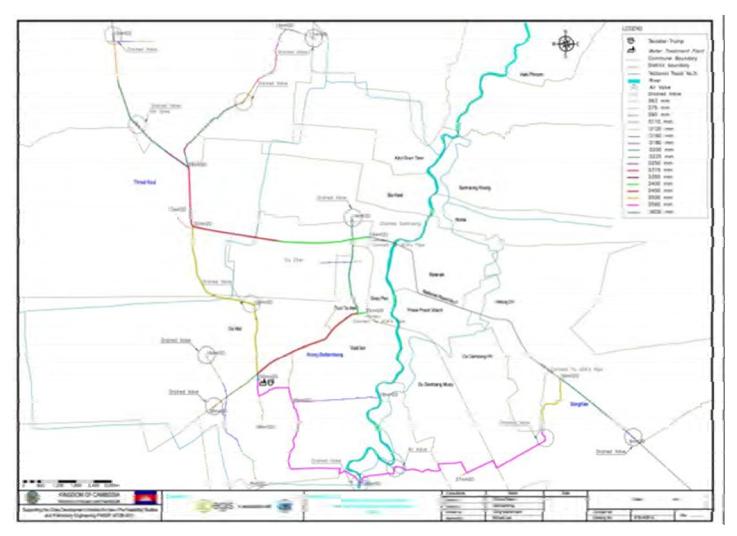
Layout plant- Piped Network of Battambang In Extension Area In 2040 (Option 1)
